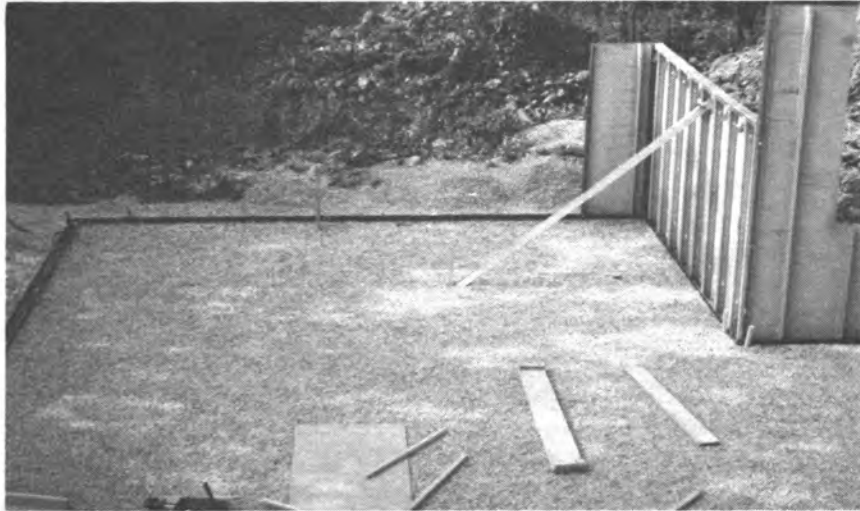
Gravel Bed, Footing Channel and Basement Panels
